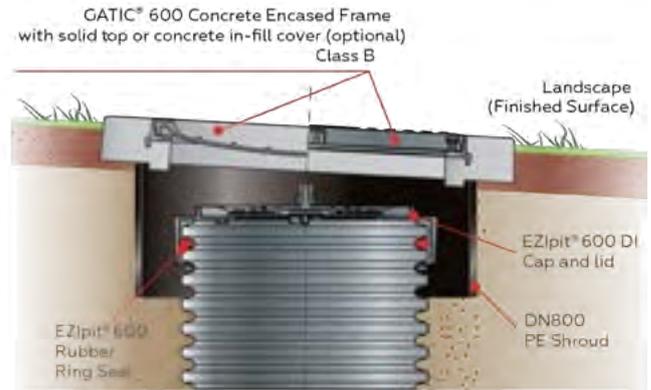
EZIpit® 600 Cover arrangement (sloped surfaces).
